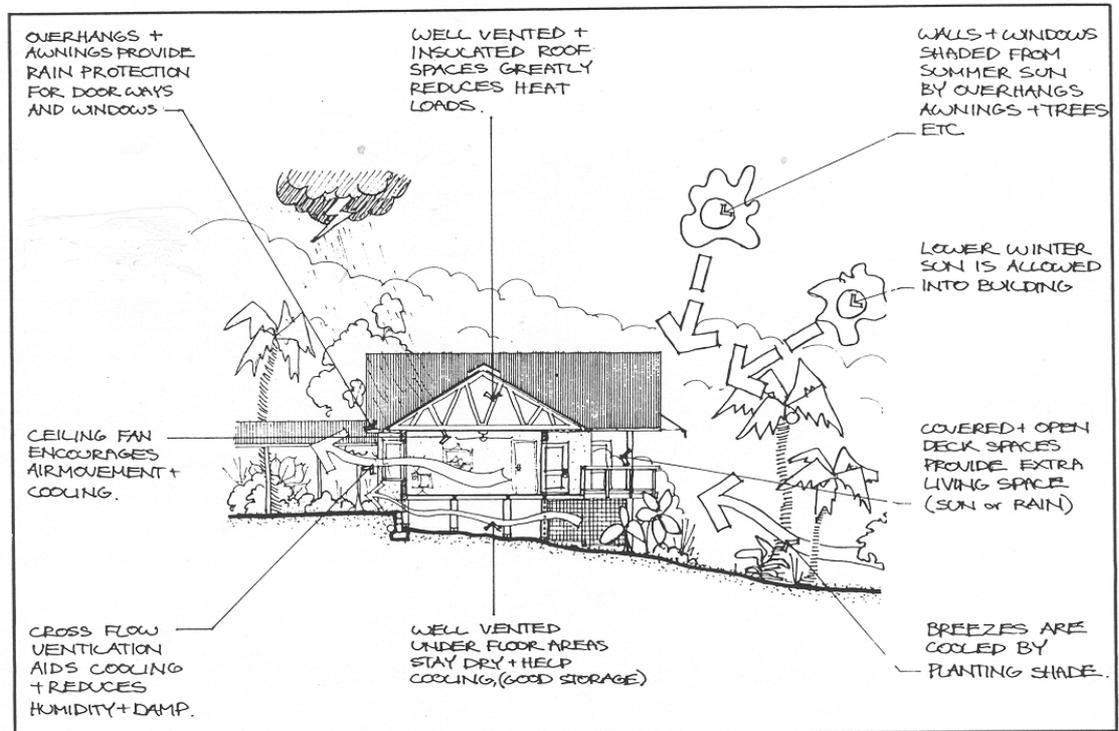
Building ventilation elements *Source: North Coast Design Guidelines
